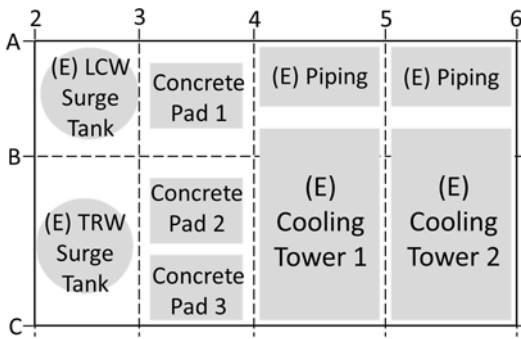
Equipment Layout on Roof: Existing (E) Conditions (Bascoul et al. 2017)
